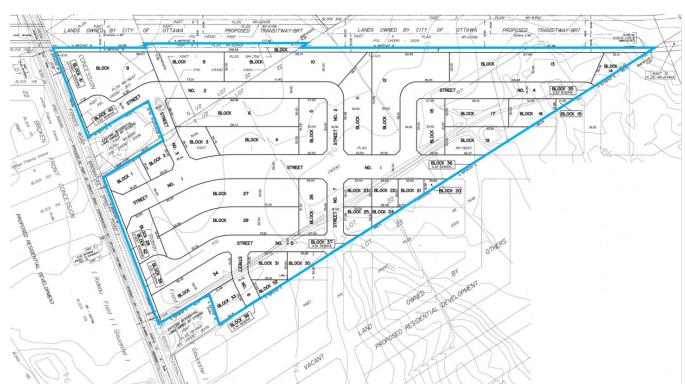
Draft Plan of Subdivision for the Subject Lands (outlined in blue)
